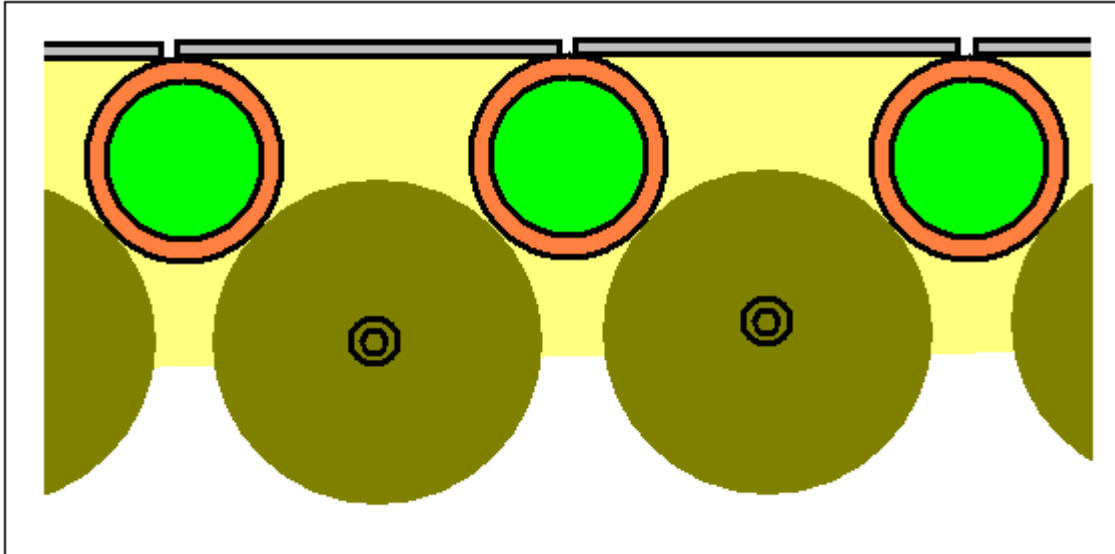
Jet grouting to prevent soil flow through a drilled pile wall
